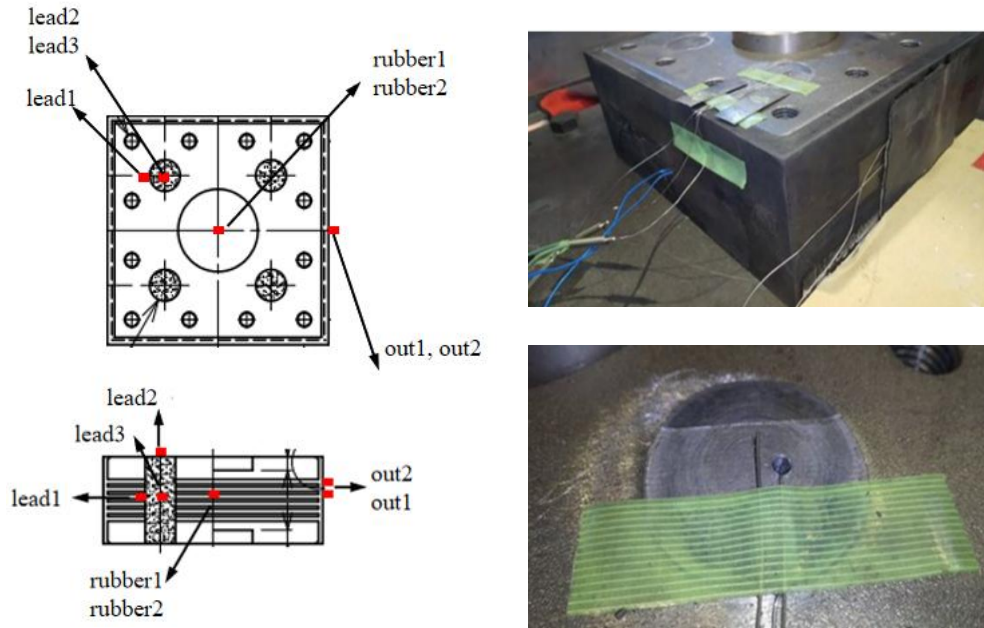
Thermocouple layout of SPR-S bearing specimen
